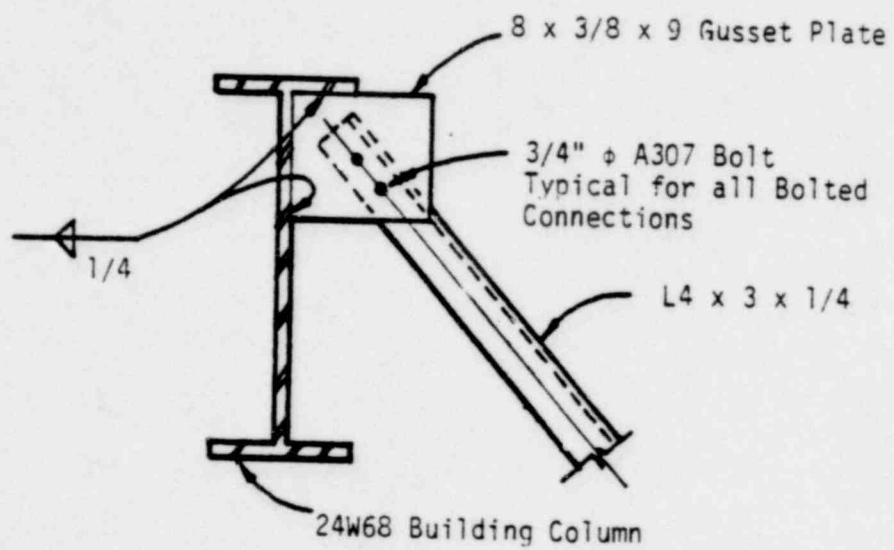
TYPICAL JN-1B BOLTED CONNECTION OF THE ROOF TRUSS
